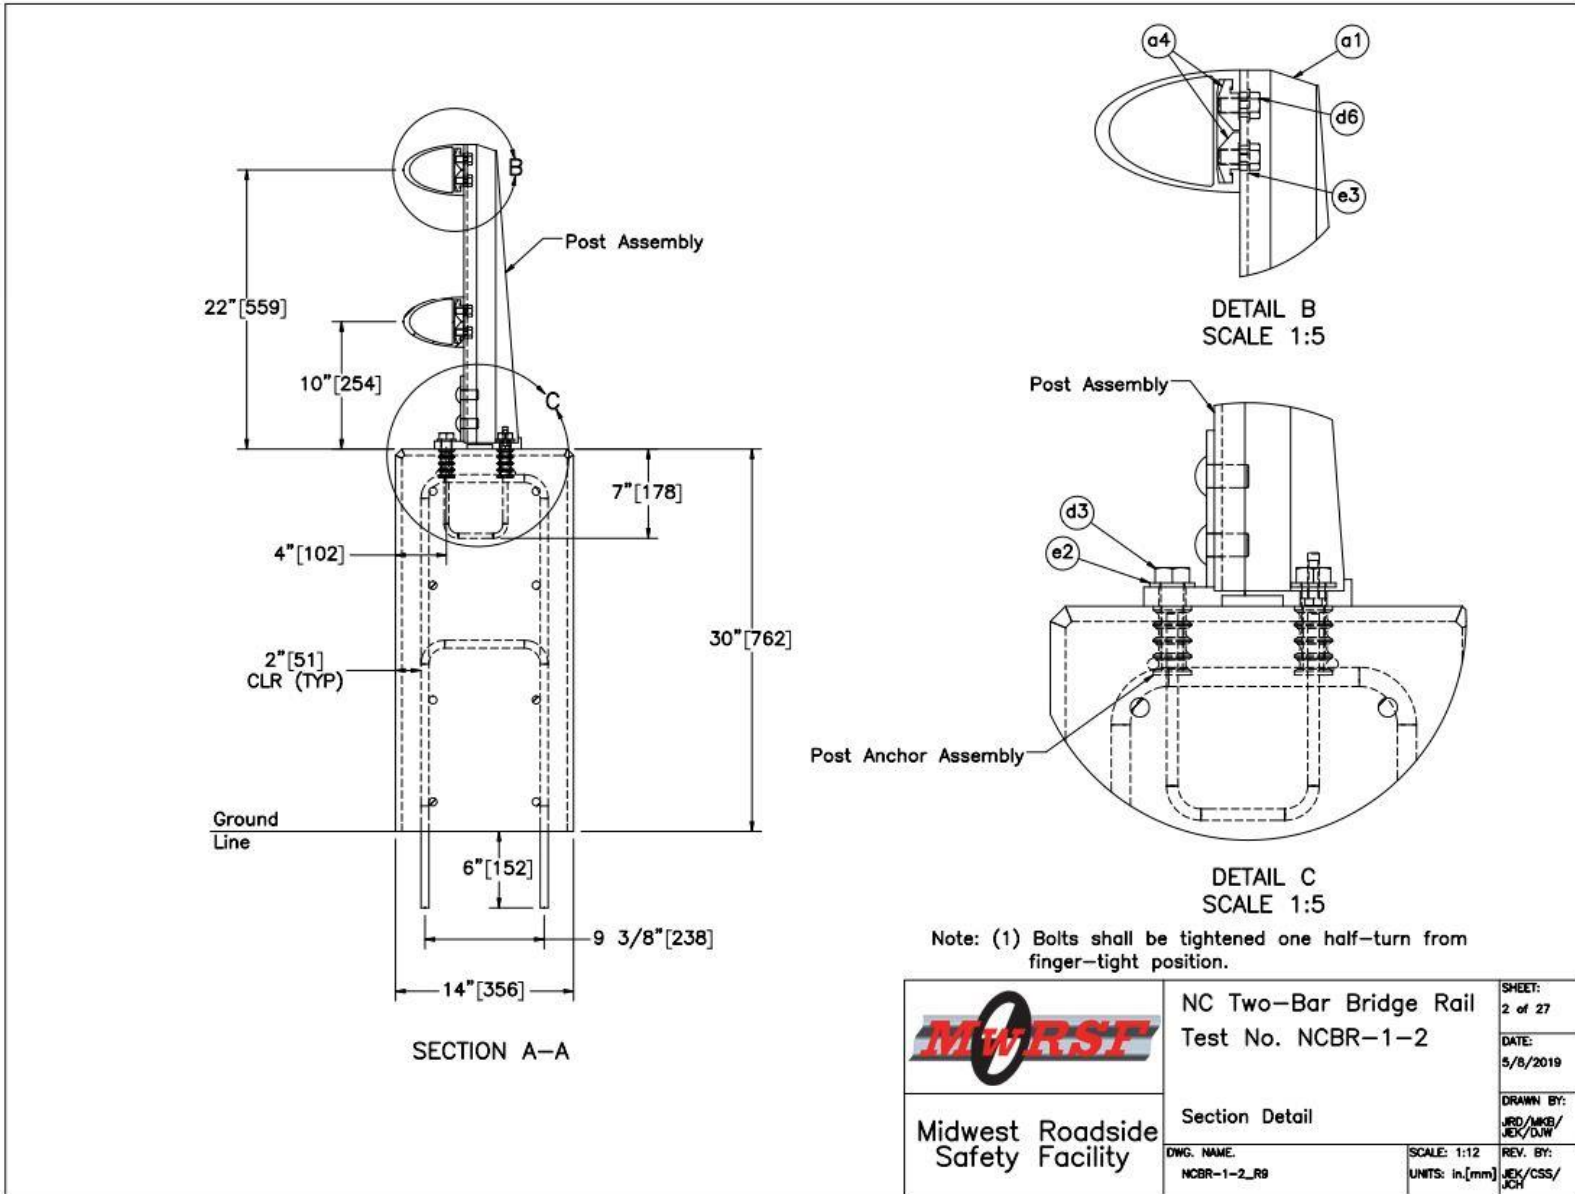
Section Detail, Test Nos. NCBR-1 and NCBR-2
